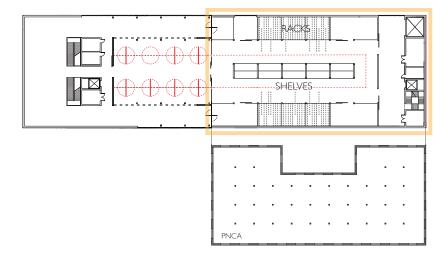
Art Storage, Typical Floor Plan (Levels 3 to 5)
